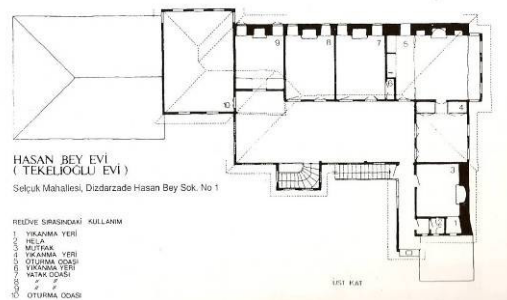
The plan type with outer hall converted to L shaped plan by adding one wing to one side.
